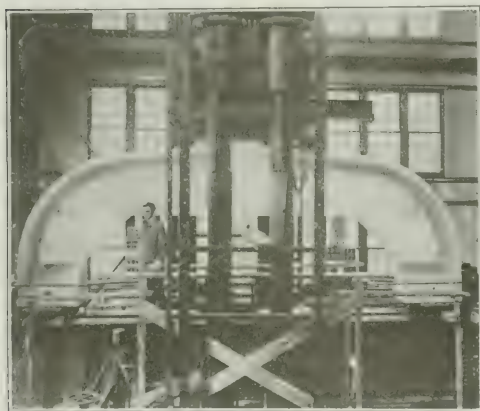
SPECIMEN SHIP FRAME IN TESTING MACHINE
